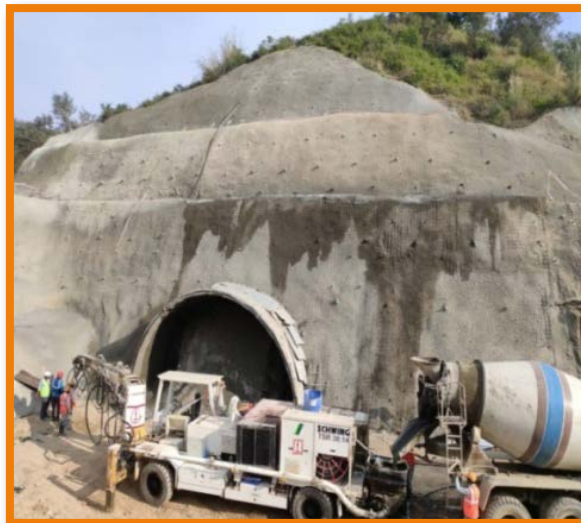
Slope above tunnel portal T2P1 and fixing of false portal after pipe roof umbrella
